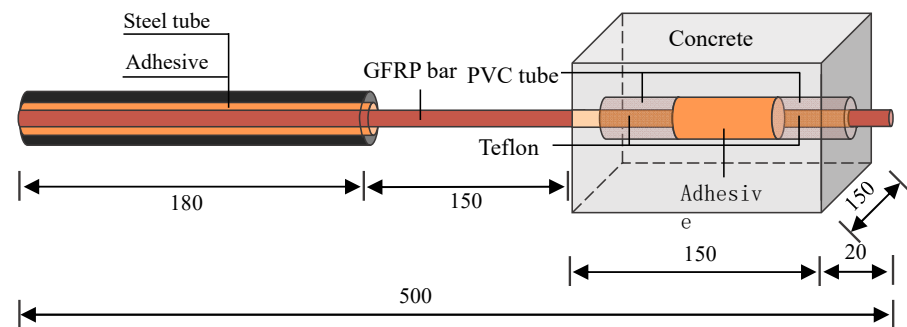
Schematic of ETS GFRP bar adhesively bonded into concrete under pullout testing.
